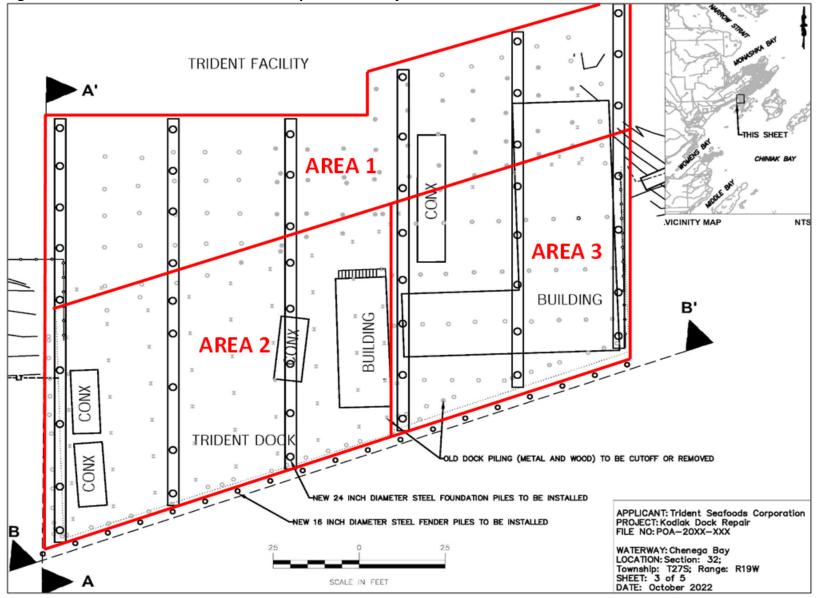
Trident Kodiak Bunkhouse Dock Replacement Project Site Plan
